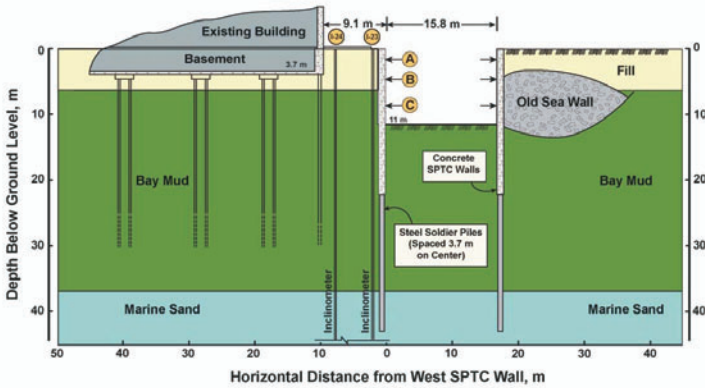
Excavation for MUNI Metro Turnback Project: SPTC Walls and Bracing System
